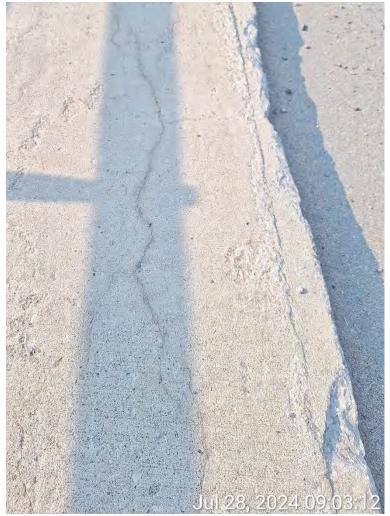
Cracks and Scaling on Sidewalk
